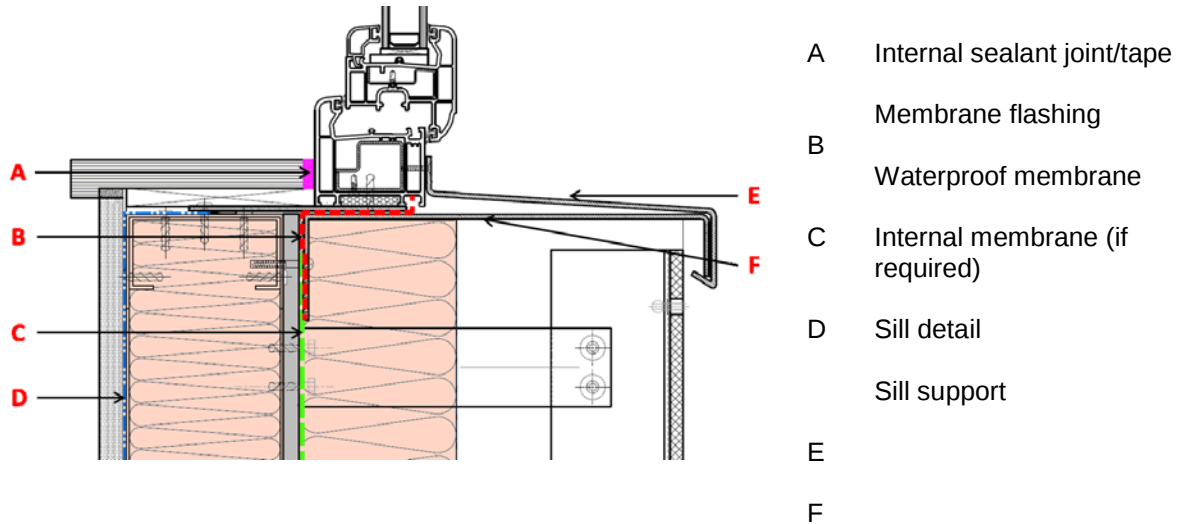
Window sill interface with rainscreen, framed back wall (insulated)
